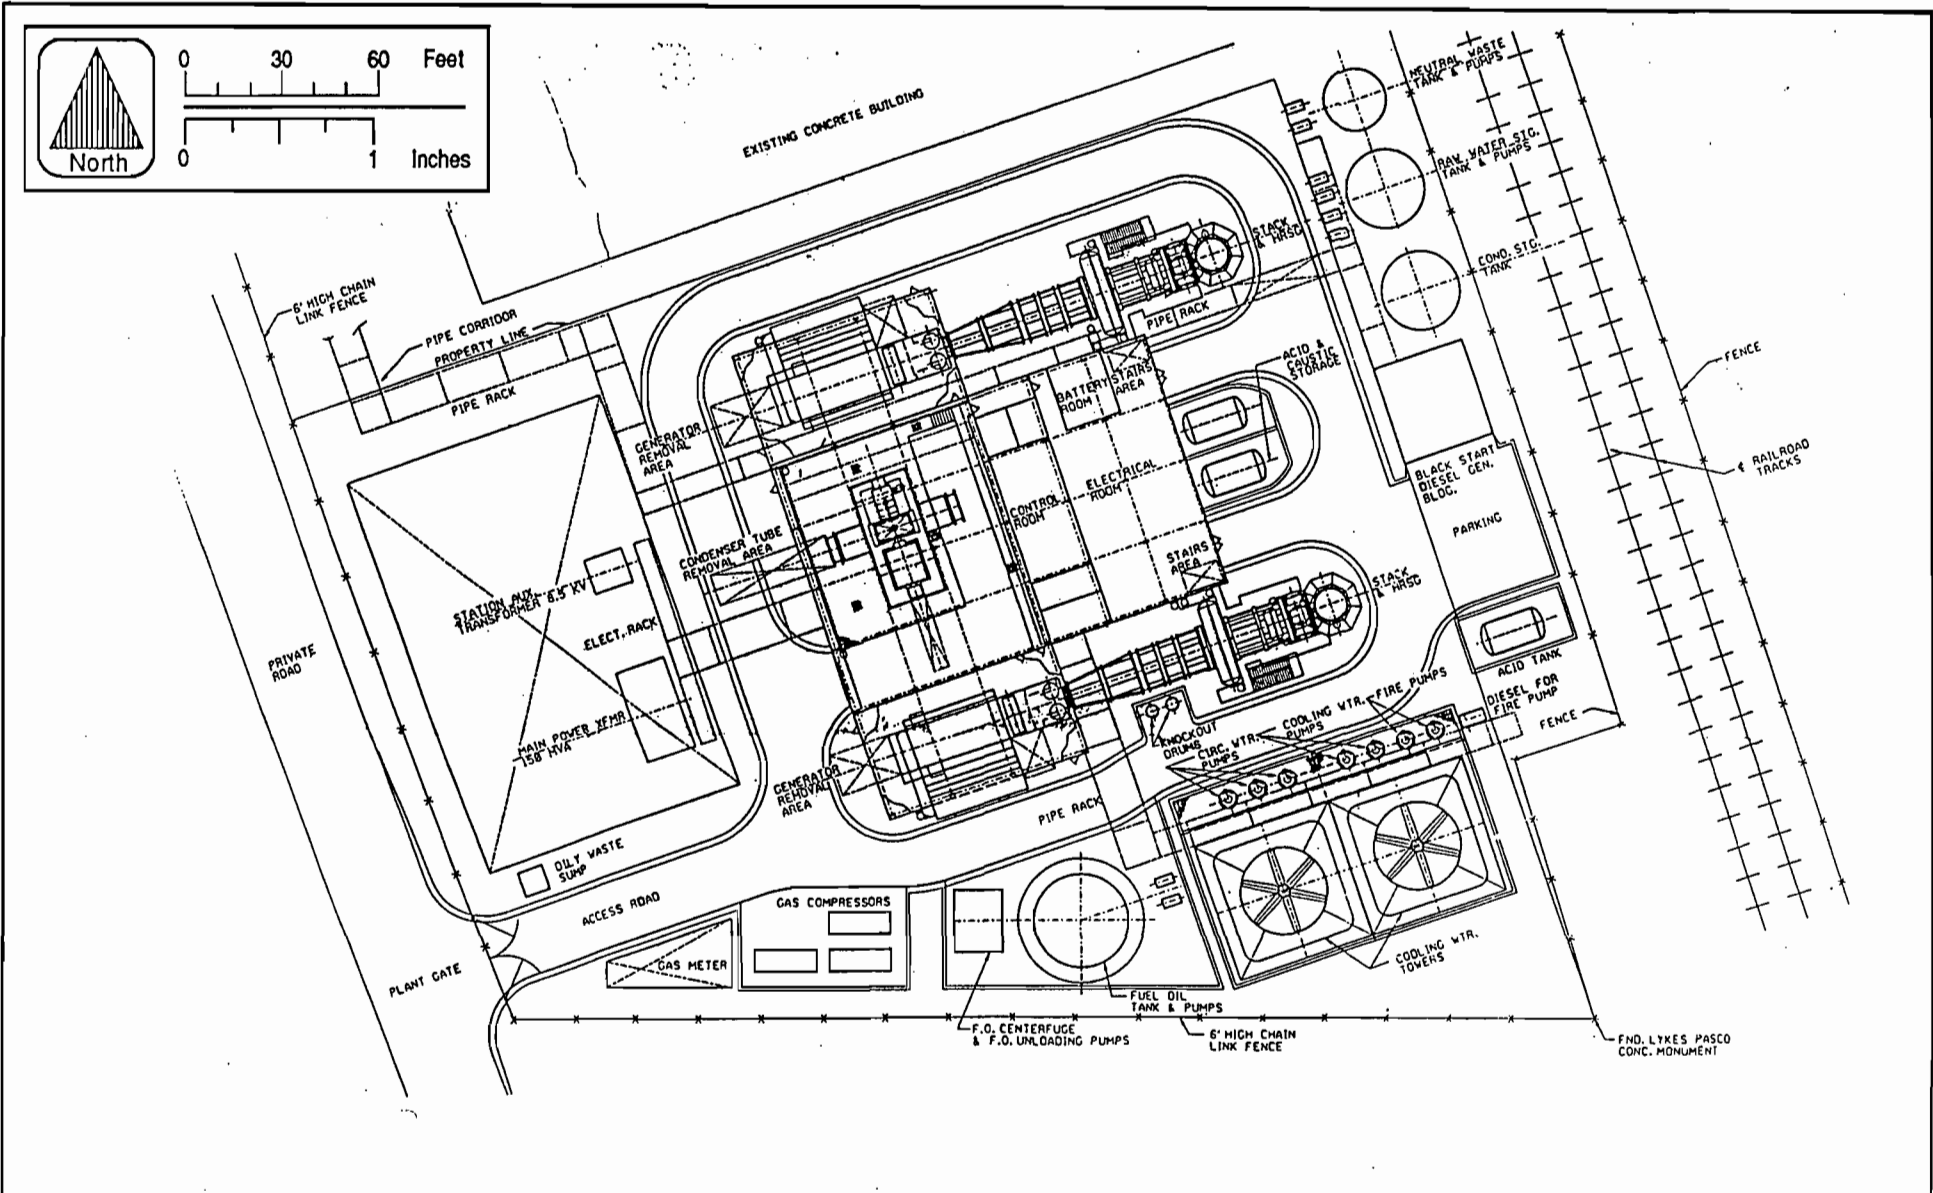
SITE PLAN OF PROPOSED FACILITY,
